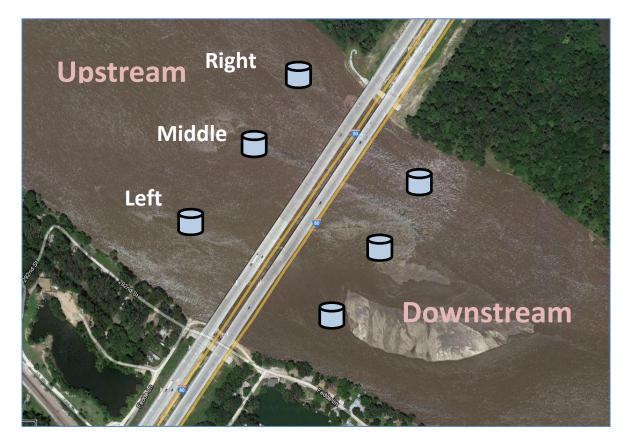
Dry weather sampling sites at the I-80 over the Platte River bridge
